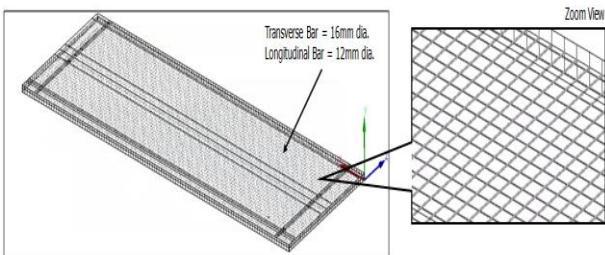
Geometrical Model for detailing of Steel Reinforcement in 200 mm thick Continuously Reinforced Concrete Pavement Road
